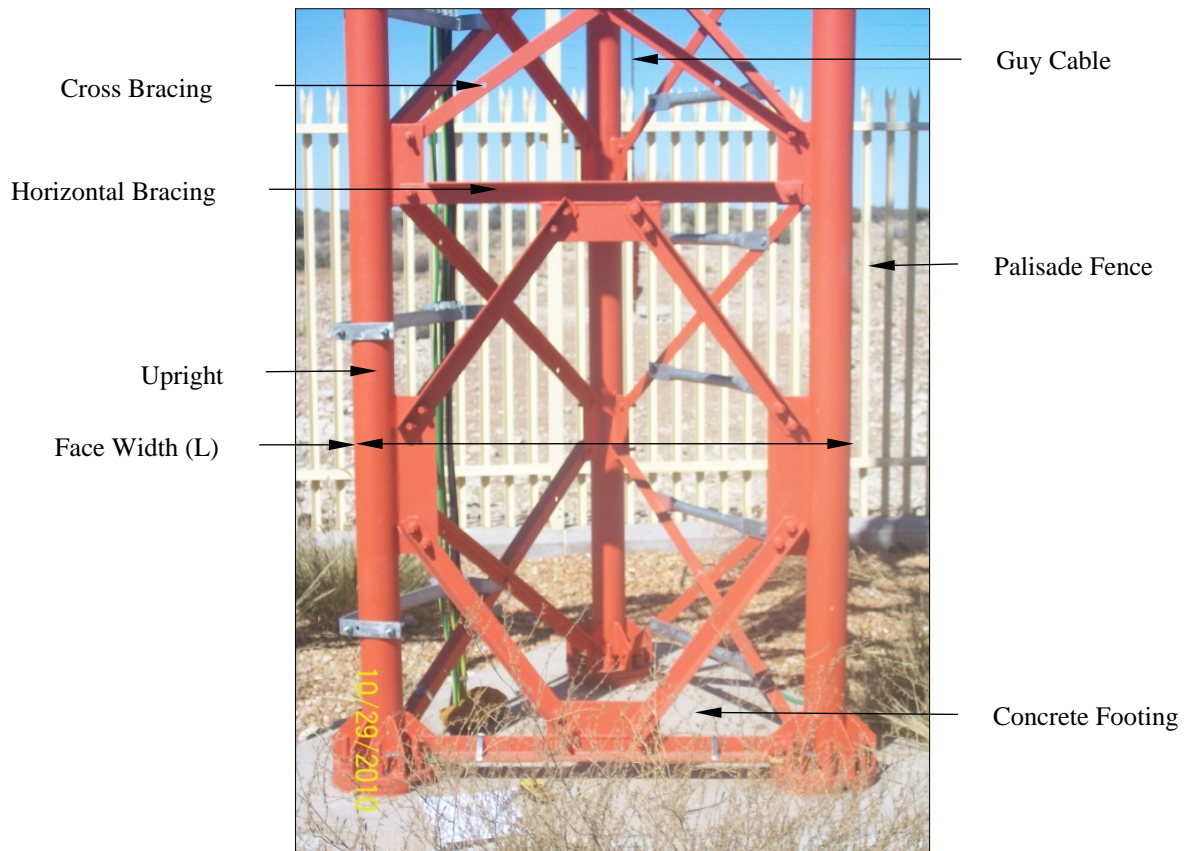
Construction details of a typical triangular footprint guyed lattice mast
